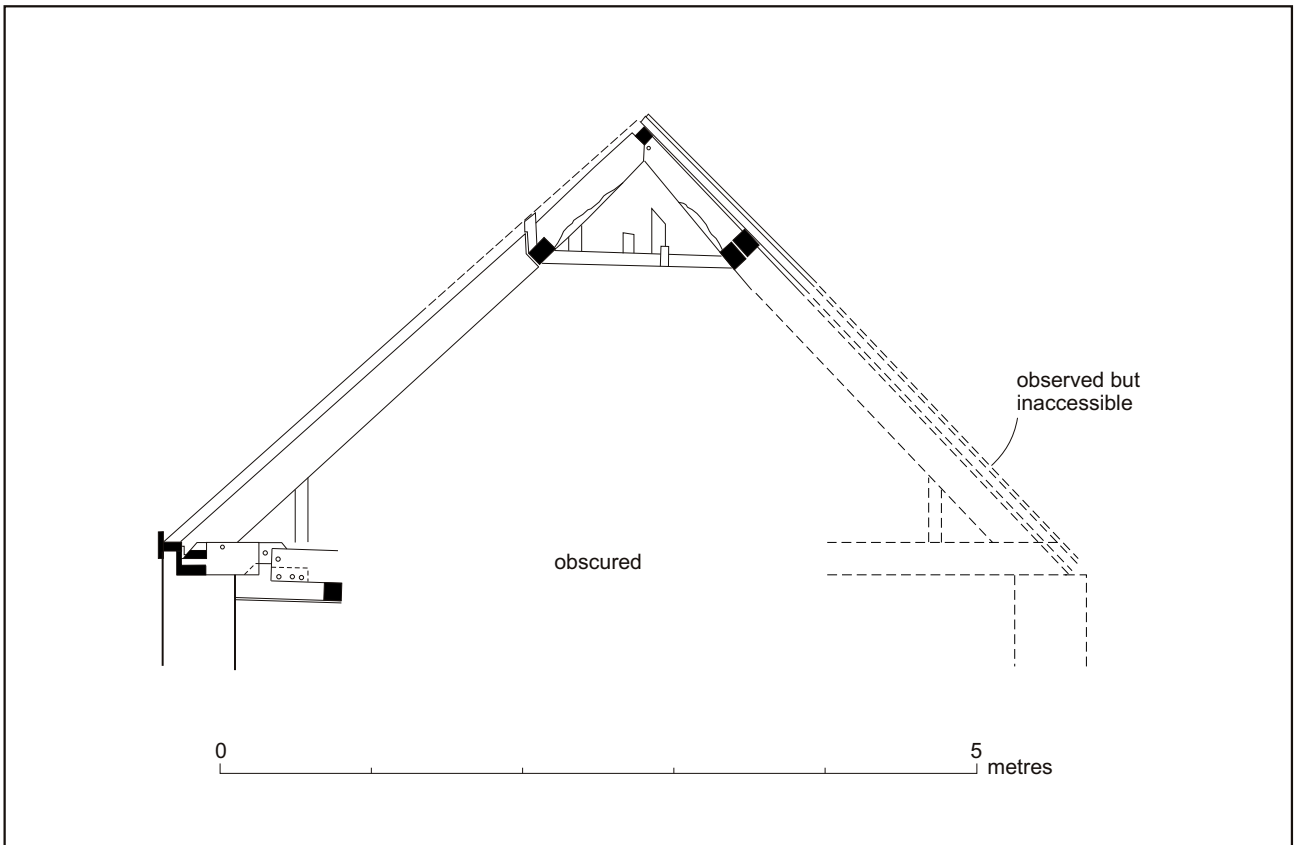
Section through the central roof of No. 9a showing the south-western truss. Scale 1:50.
